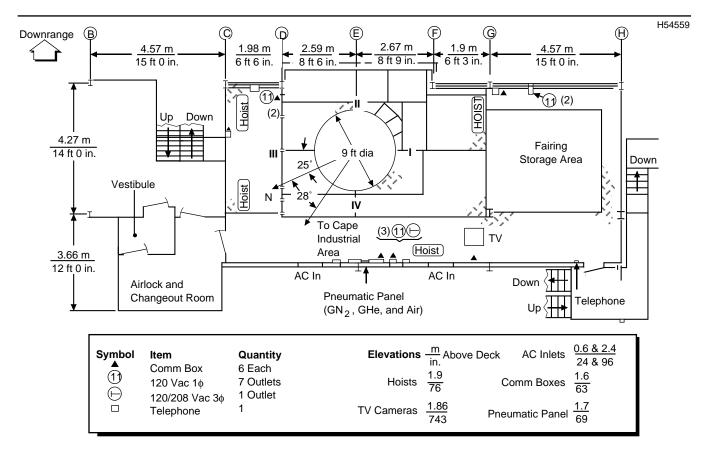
Level 9A Floor Plan, Pads 17A and 17B
